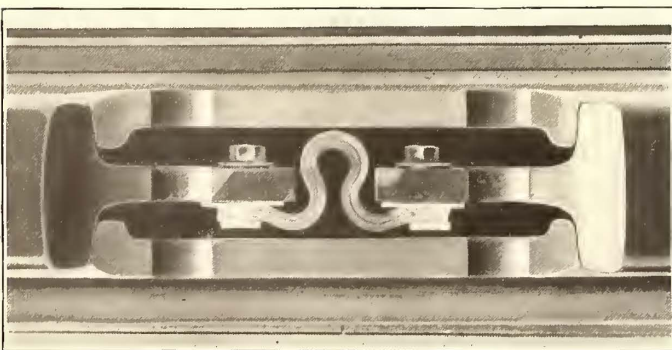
HORIZONTAL SECTION OF BOND APPLIED TO 90-LB. RAIL
